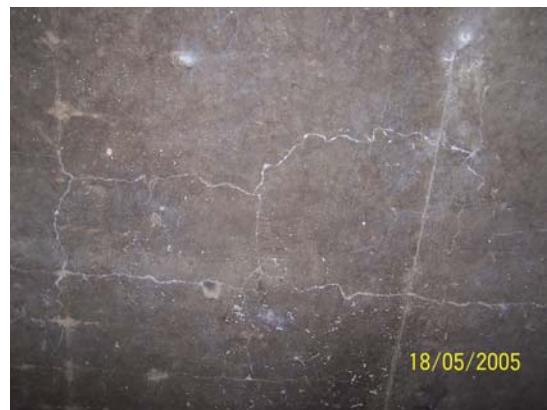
Cracking at the underside of concrete deck slab of a steel truss bridge
